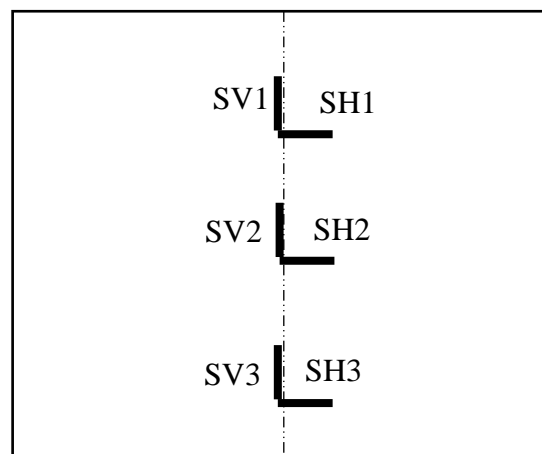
Instrumentation – location of strain gauges (elevation view)
